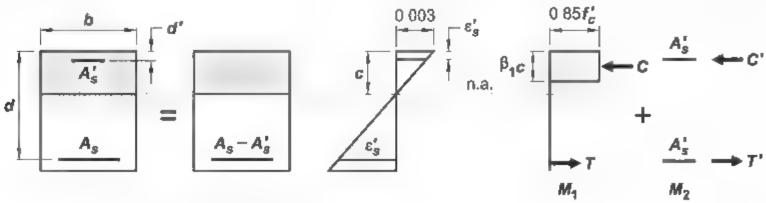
Forces in a doubly reinforced concrete beam
